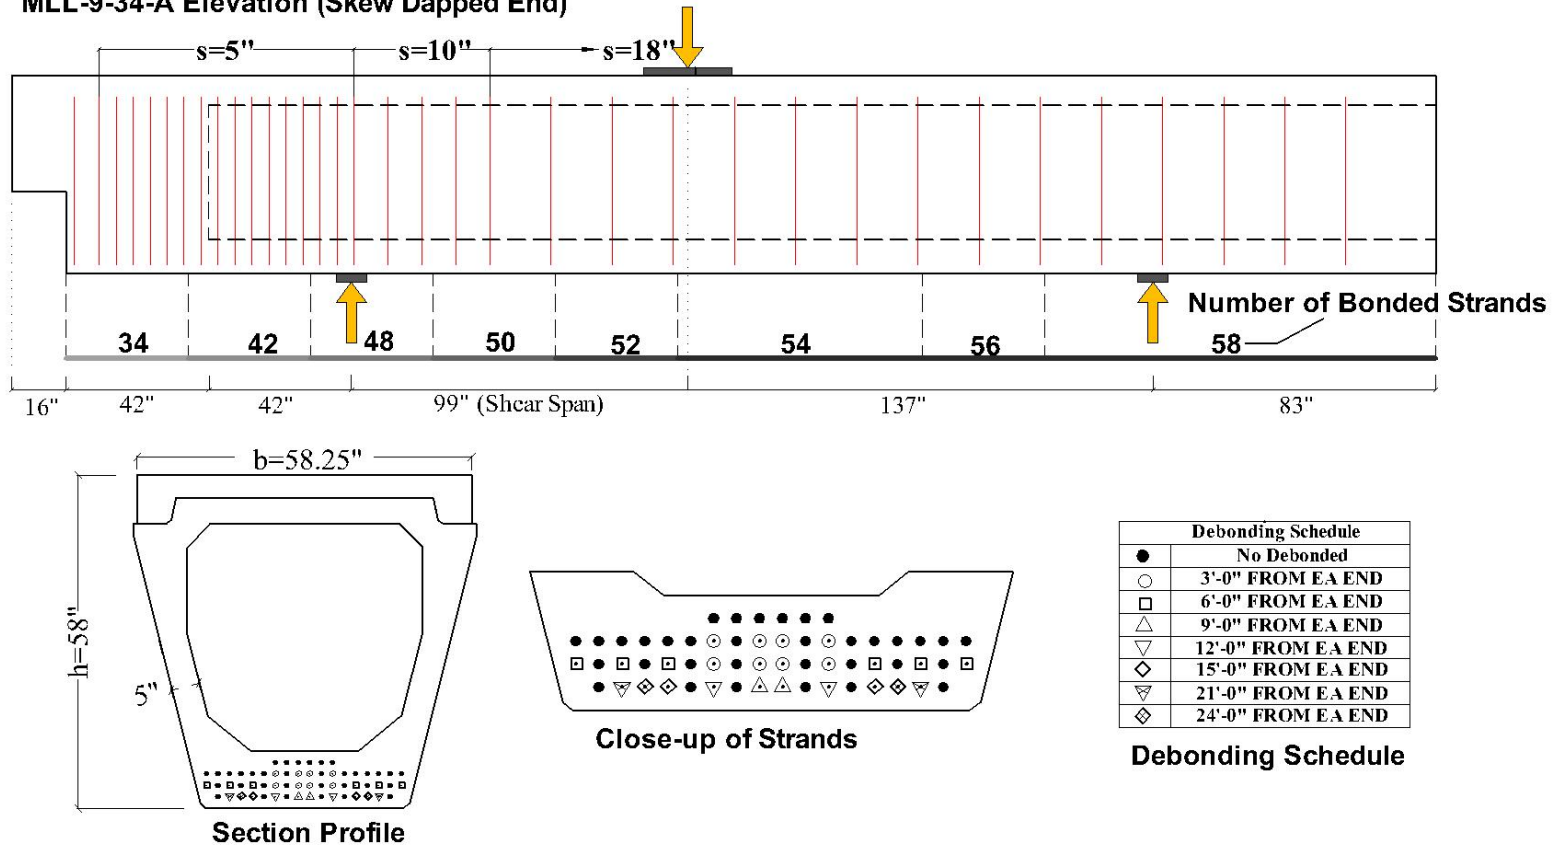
MLL-9-34-A Elevation, section, and debonding schedule
